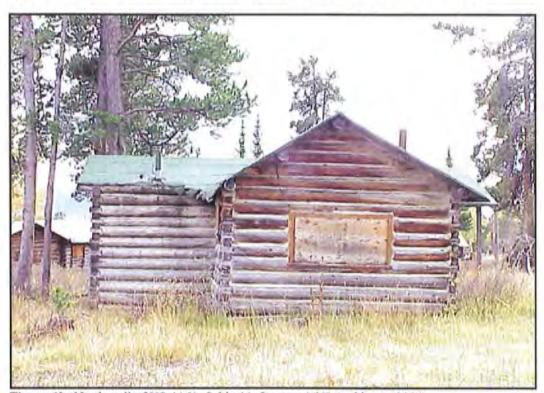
North wall of HS-1161, Cabin 11. Source: A&E Architects, 2004.
